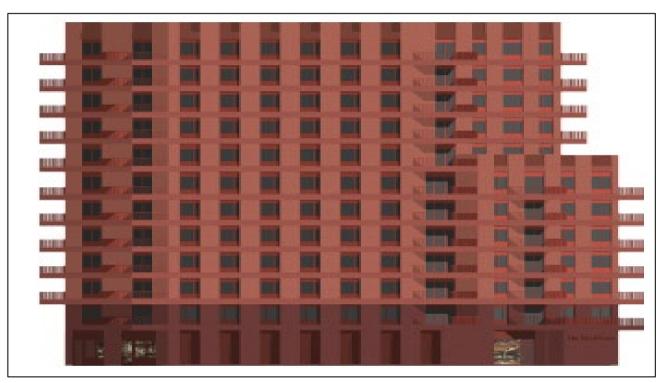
Façade Design Building Plot H/2 (East Elevation)
